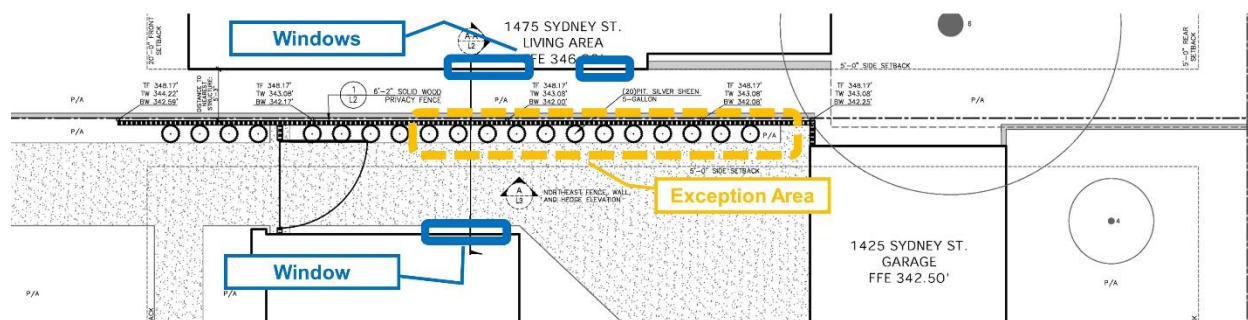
Site Plan showing limited exception area (orange) and window orientations (blue)
